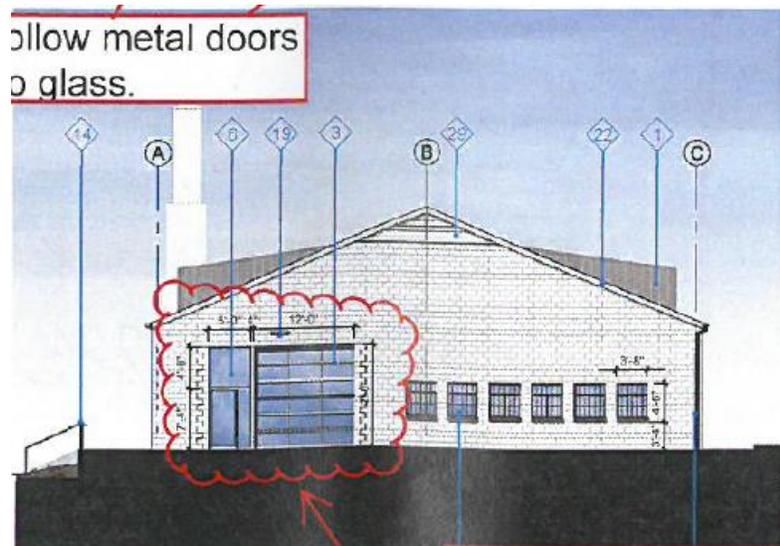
Approved LAC drawings, North Elevation, 2016. Notes indicates new storefront opening to be aligned flush with exterior block.
